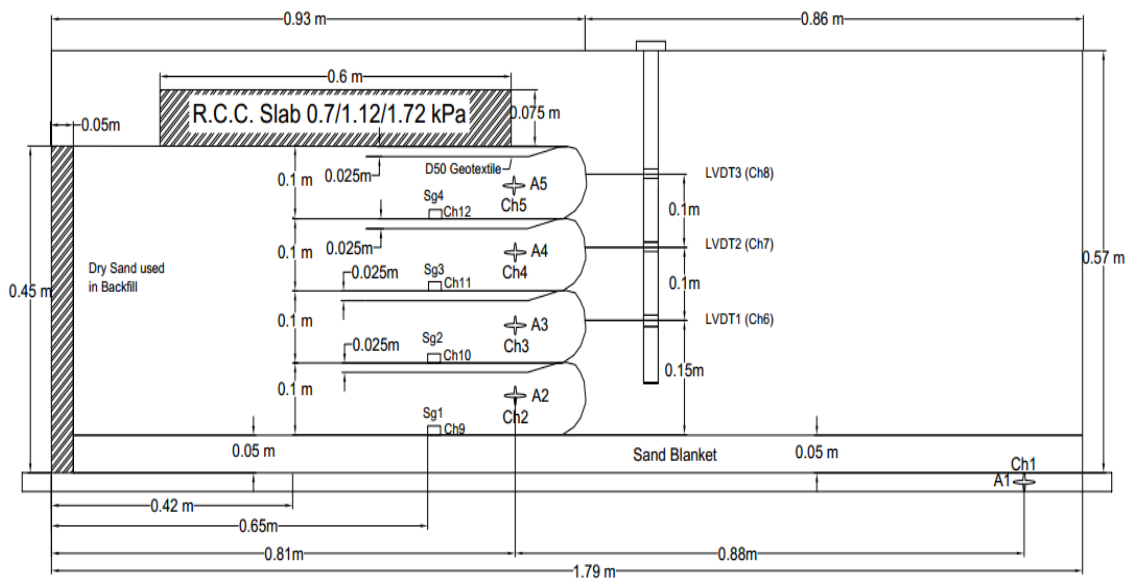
Wrap-faced reinforced retaining wall model for Shake Table Test
